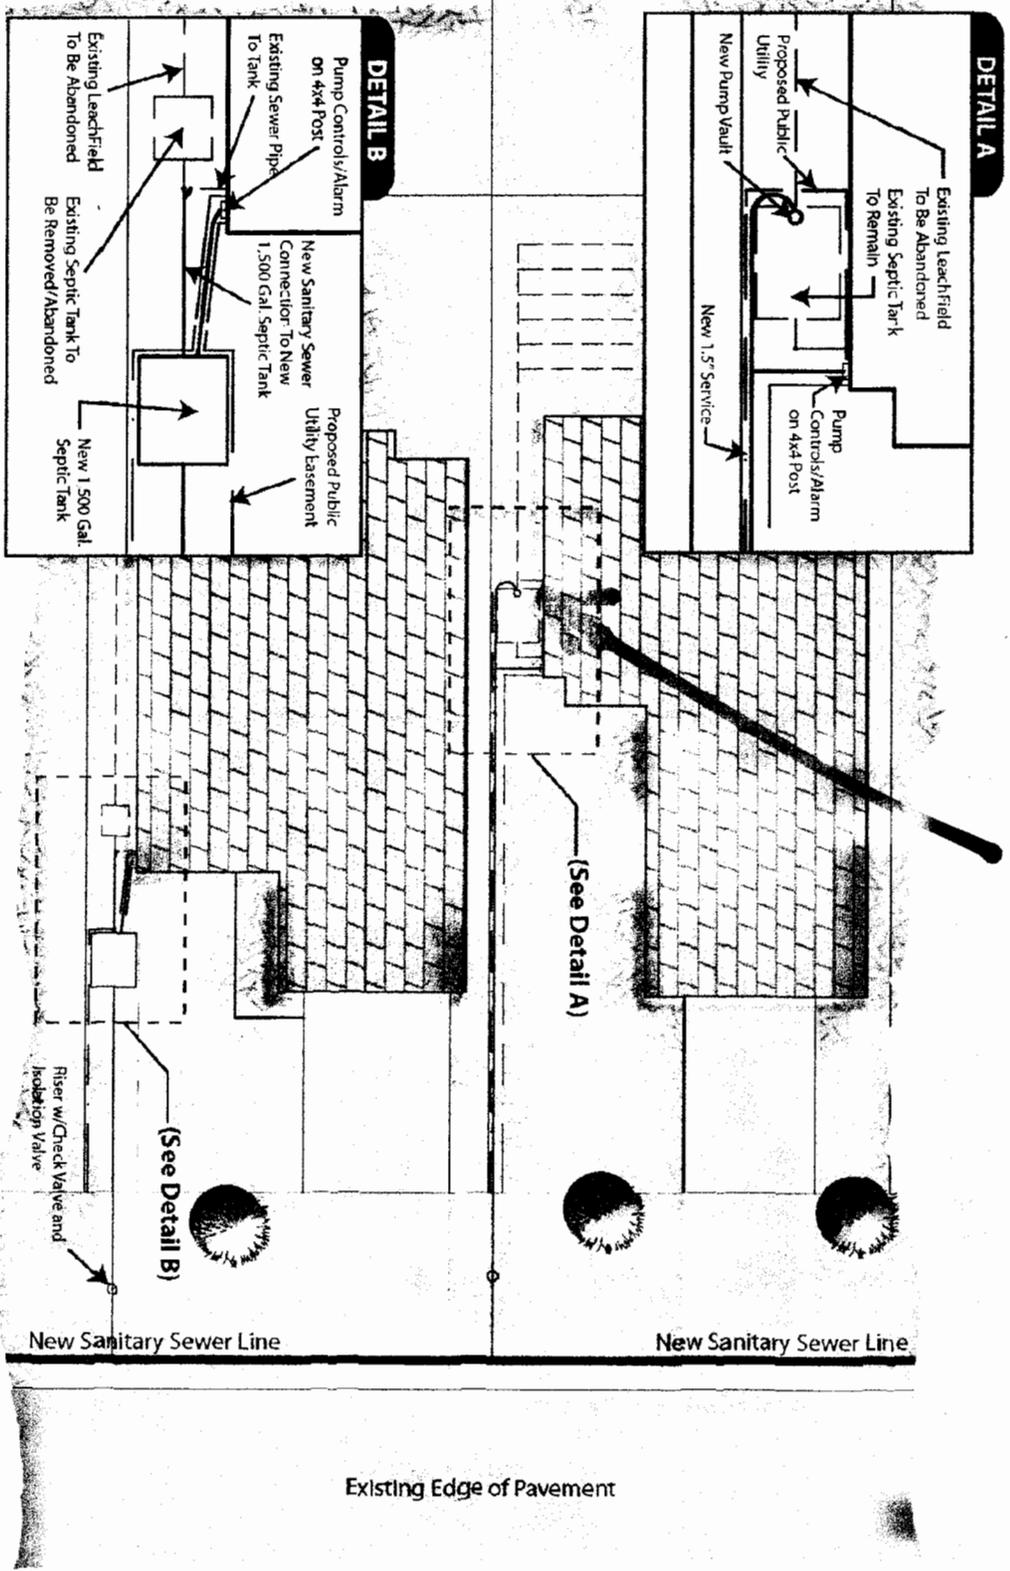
Typical Septic Tank Locations – Retrofit & New
